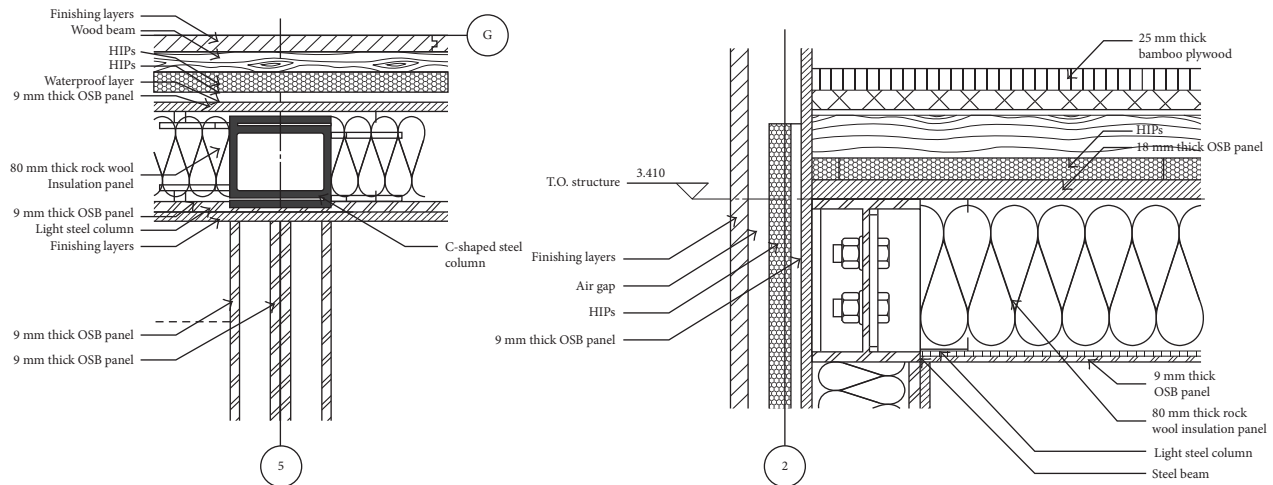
Exterior wall construction detail using the HIP's insulation layer (source: authors' own data).
